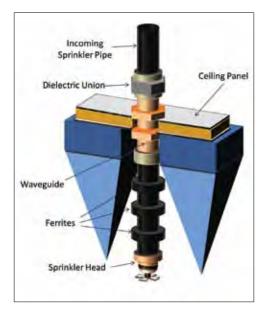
Construction of sprinkler at anechoic chamber ceiling.
